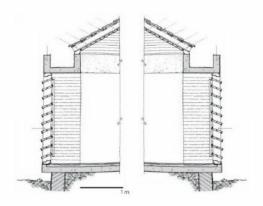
Details of the louvered windows Photo credit : Correa, Charles
